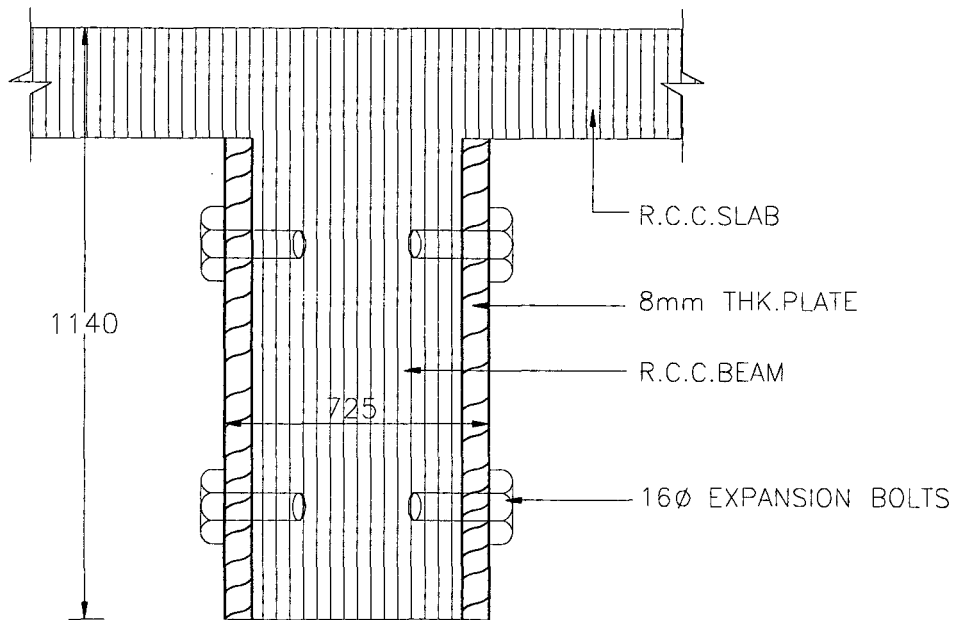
& 2.10 Beam strengthening and repairs is a common requirement. Replacement of damage beam concrete is a basic requirement. Particular problem of stirrup corrosion is common. It is explained with couple of options in the figures.
